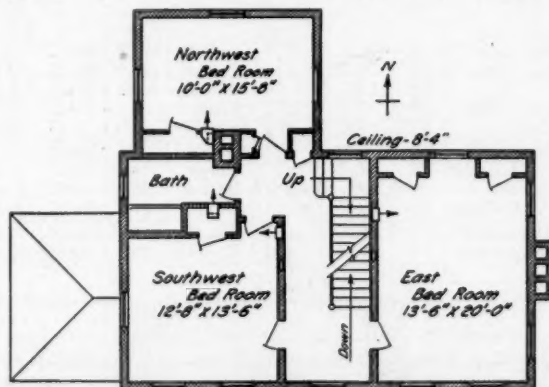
SECOND FLOOR PLAN WITH LOCATION OF WARM-AIR REGISTERS
